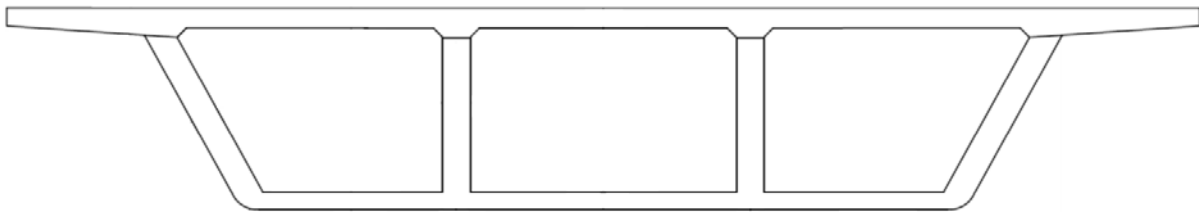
A typical cross sectional view of a CIP / PS Box used for bridge construction
